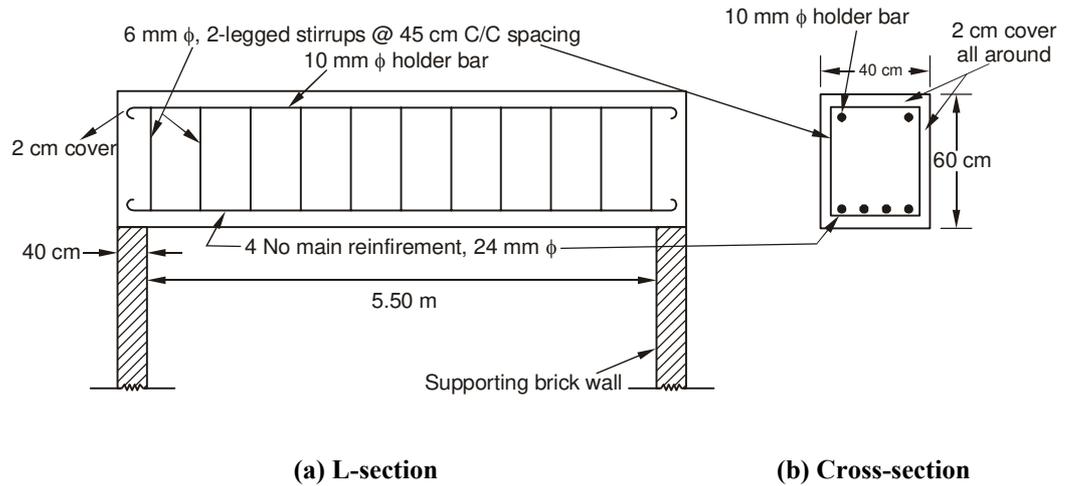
MS Reinforcement of a Simple RCC Beam (Not to Scale)
